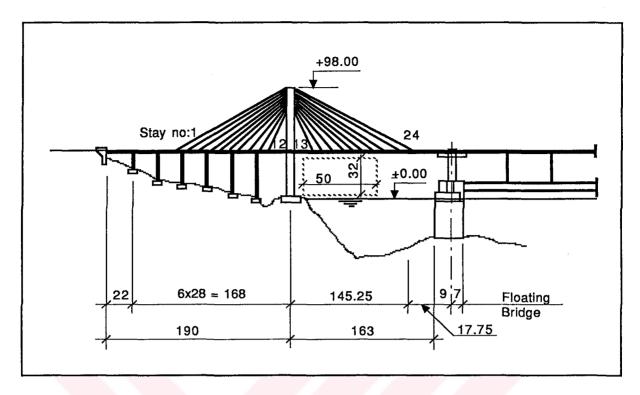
CABLE-STAYED BRIDGE ELEVATION (In meters)
